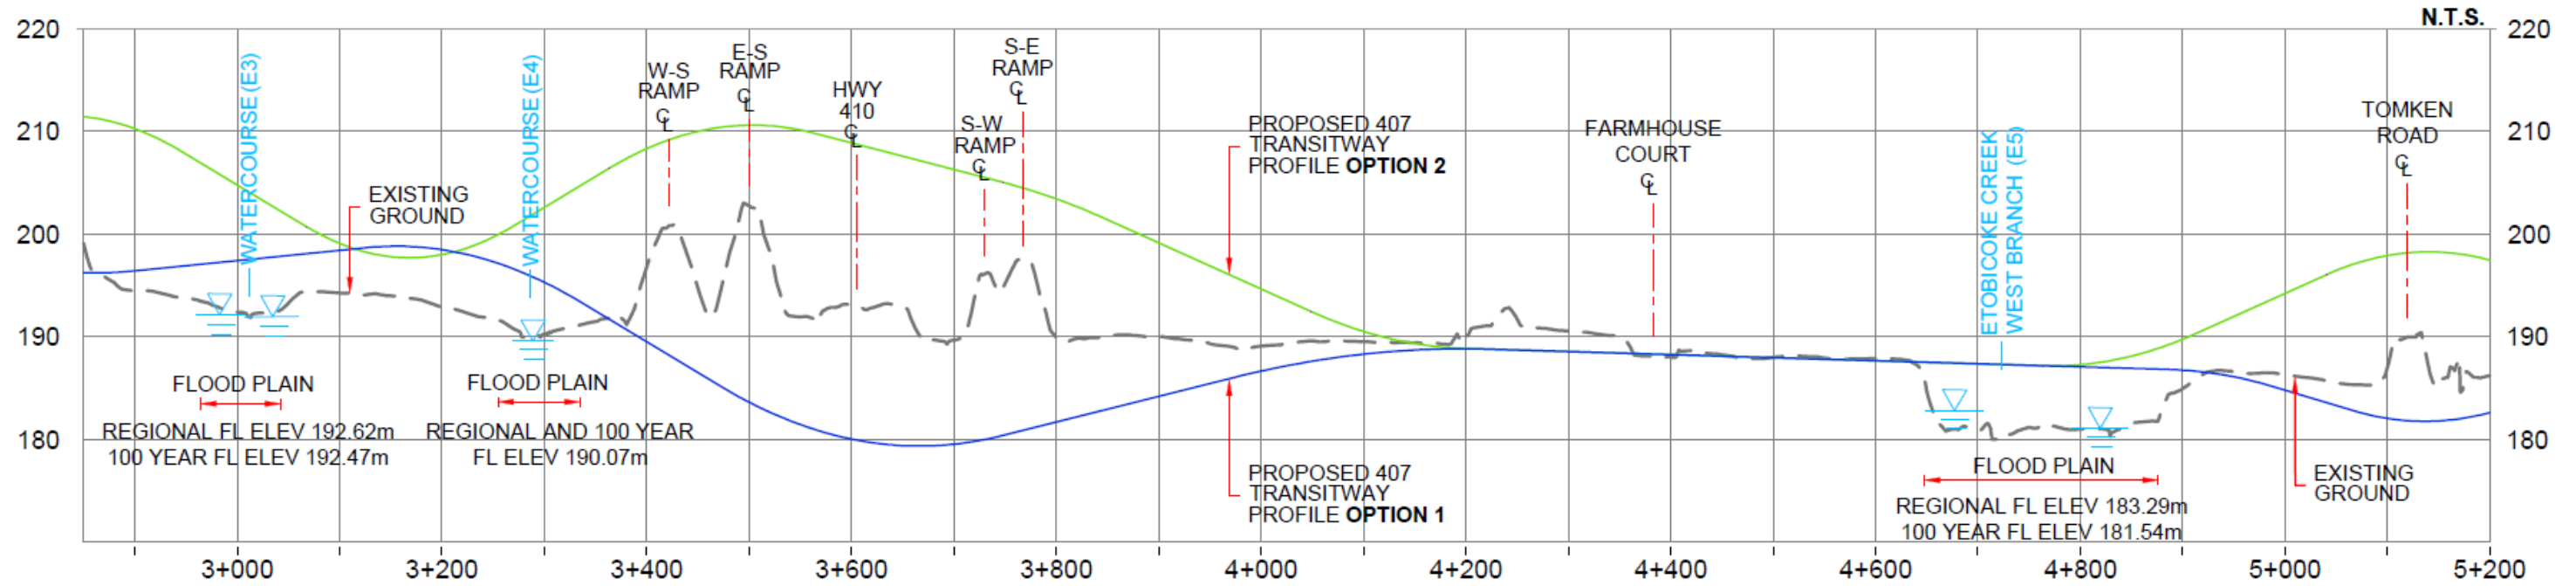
A: SEGMENT B, EAST OF KENNEDY ROAD TO WEST OF TOMKEN ROAD ALIGNMENT ALTERNATIVES
